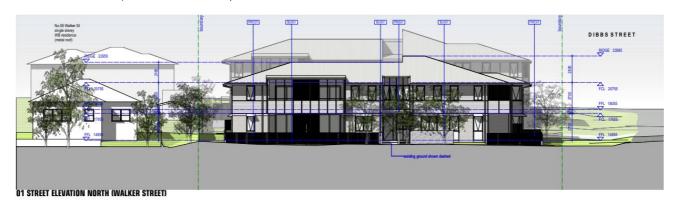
Extract from Architectural Plans – Street Elevation North (Walker Street) (Source: Architectural Plans, Kennedy Associates Architects, dated 26/04/2023)
